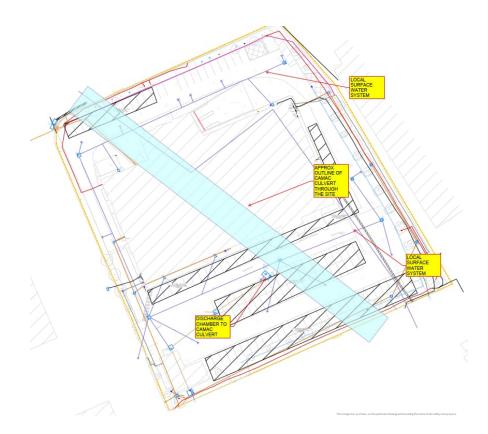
Utility Survey of Existing Surface Water Drainage
